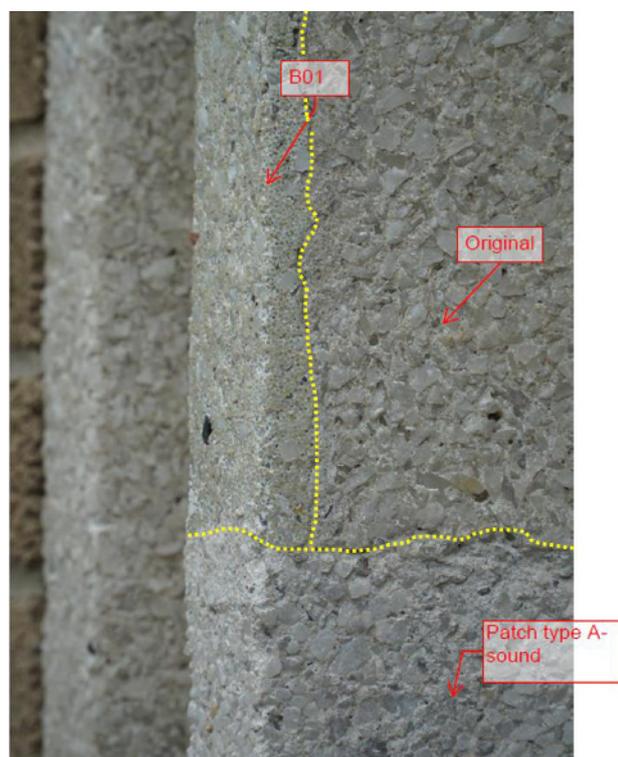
Intersection of repair B01, the original concrete, and a repair from campaign A.
